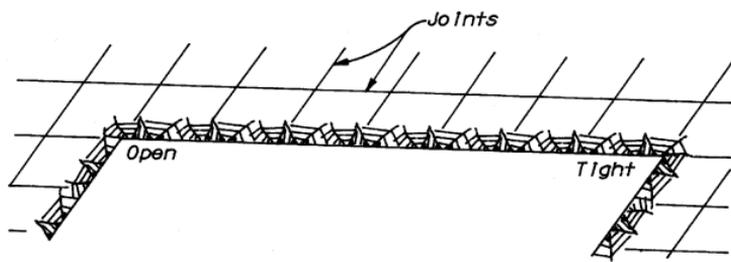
Tight and open corners caused by jointing (plan view).
